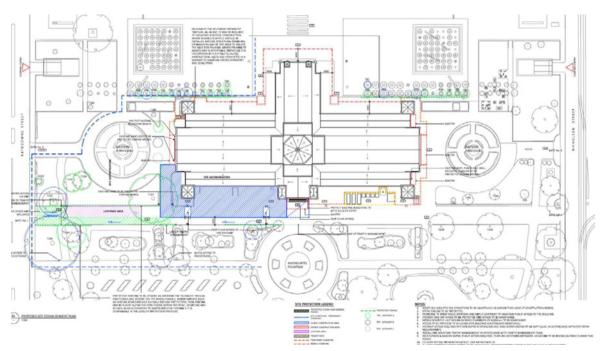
Exerpt from Proposed Site Establishment Plan & Promotion Works Extent. Source: Lovell Chen, 19.02.18
